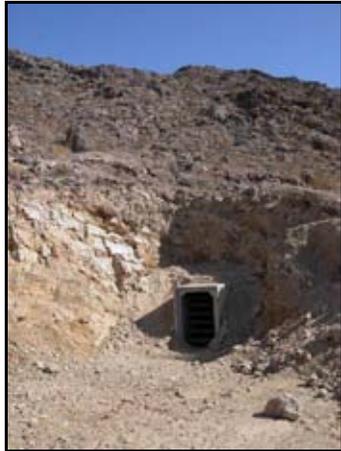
Adit closed with a bat gate, concrete culvert and foam protection outside the culvert. Note minimal disturbance to surrounding area.
